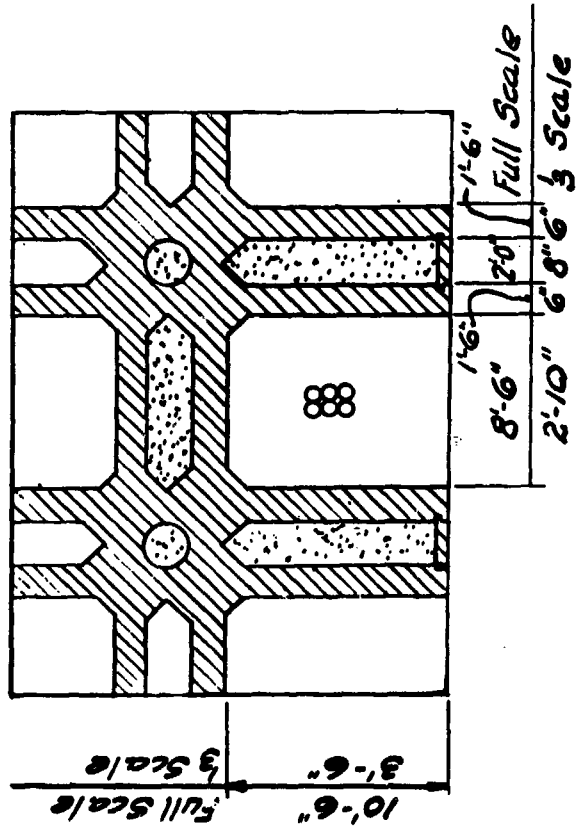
PLAN OF 1/3 SCALE MODIFIED C-13 CUBICLE
